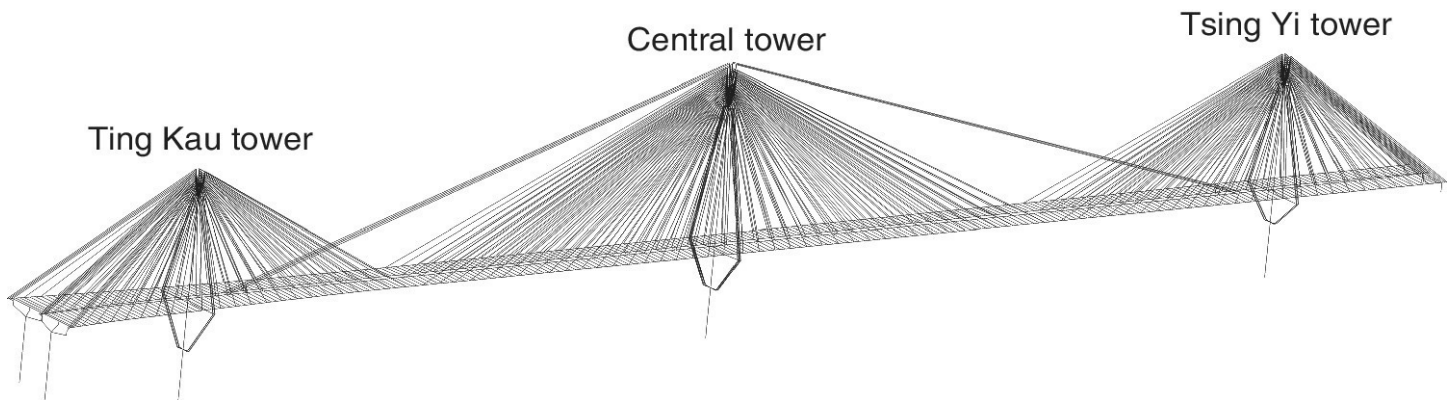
Threedimensional finite element model of Ting Kau Bridge.
